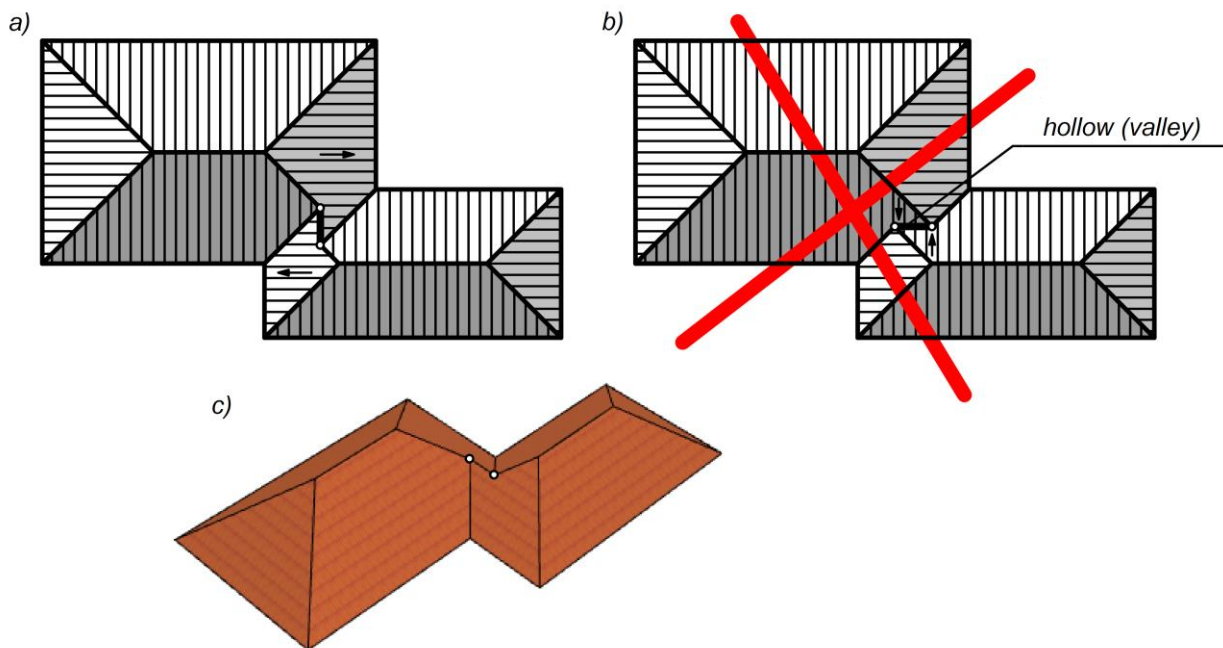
Placement of horizontal edge (ridge) in the general part of the plan of roof: correct (*a – the top view; c – in perspective*) and inadmissible (*b*)
